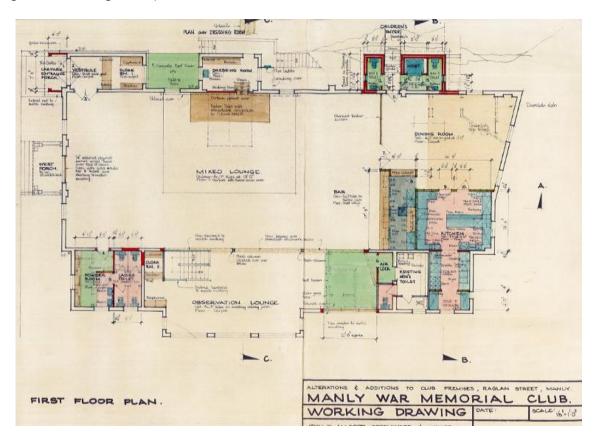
Undated (Likely 1971) working drawing (Unknown Author provided by Northern Beaches Council)
